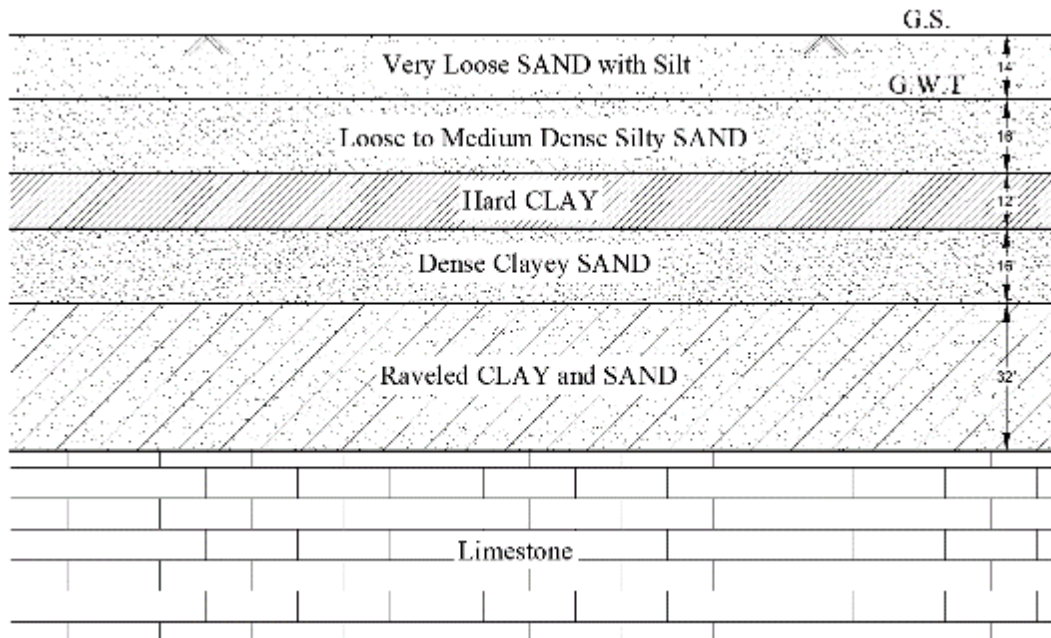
Geotechnical section of bridge area at Wekiva Parkway
